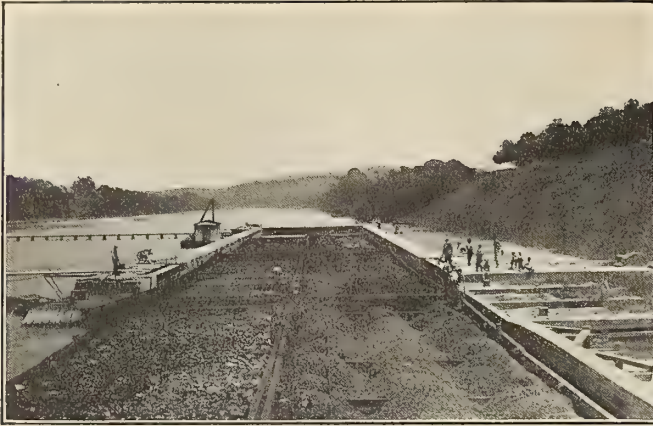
Coal Barges in Lock Chamber at River Dam
